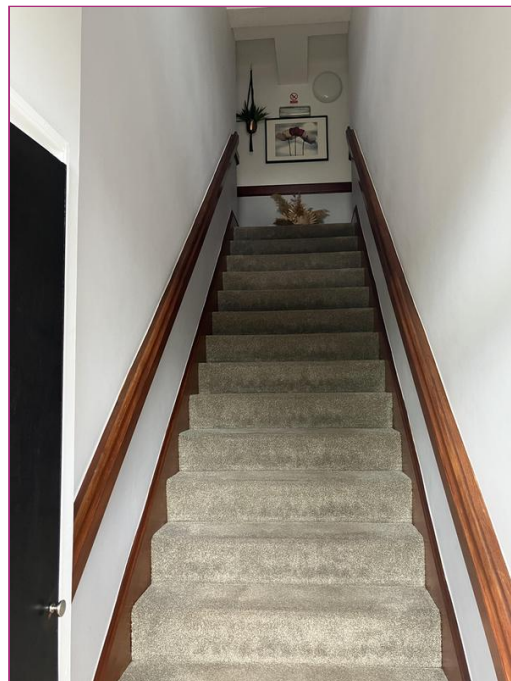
No fire safety information to Block 12-14 or 18-19.
